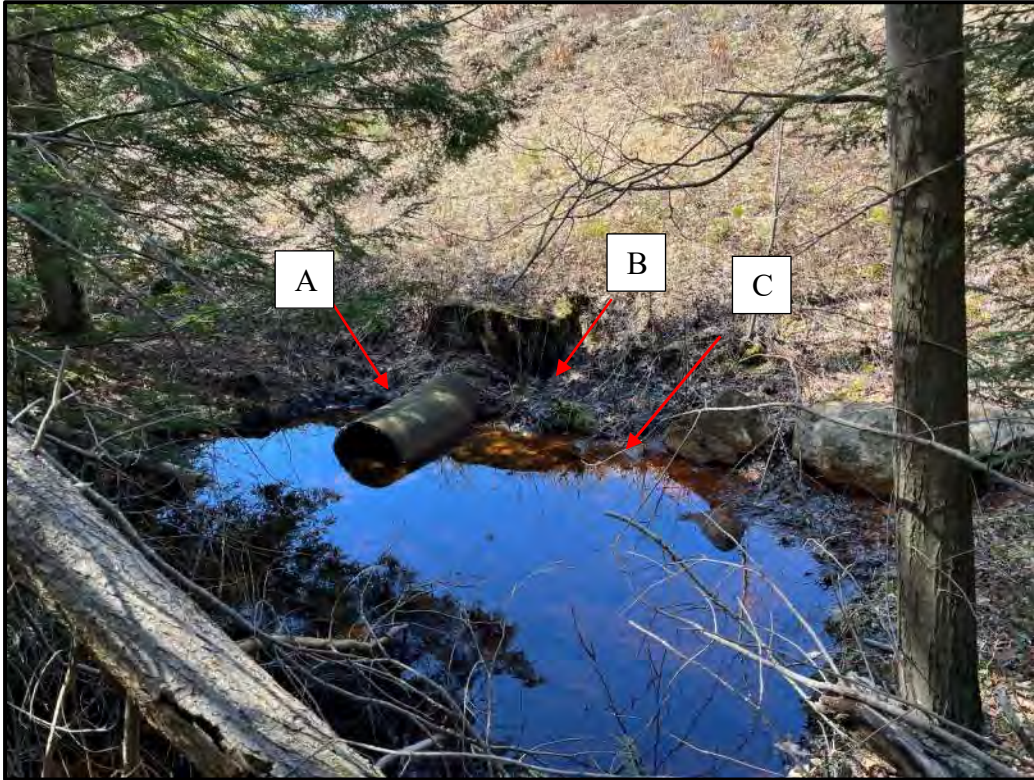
Outlet structure discharge conduit; note that outlet has a crack “A” (see Photo 25), concrete is undermined and displaced “B”, and seepage with iron staining “C”
